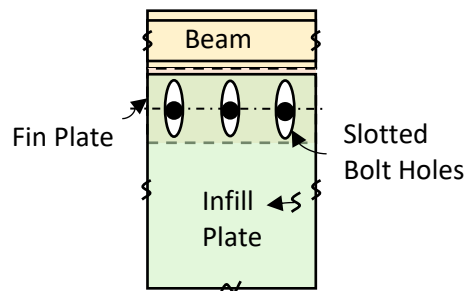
A possible slotted bolted plate-to-boundary beam connection to prevent gravity load to be transferred to the infill plate
